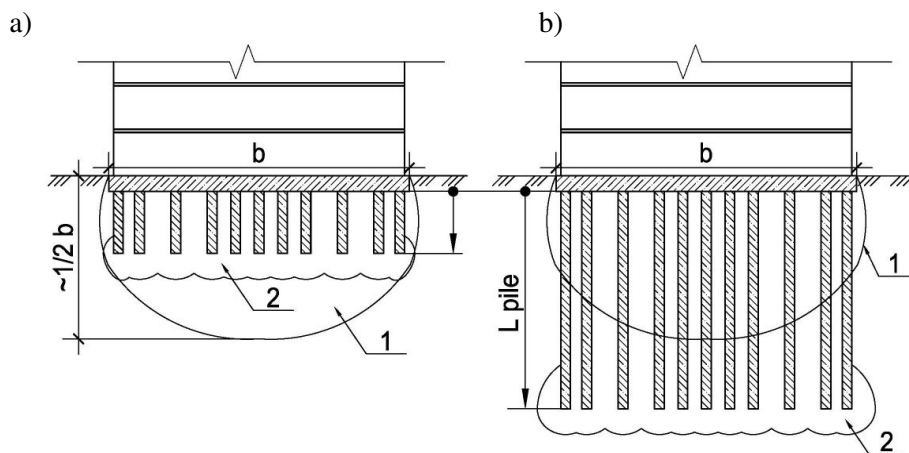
Schemes of the interaction of a building with soil: a) pile base, b) pile foundation; 1 – deformation zone under the grillage, 2 – deformation zone under the sole of piles
